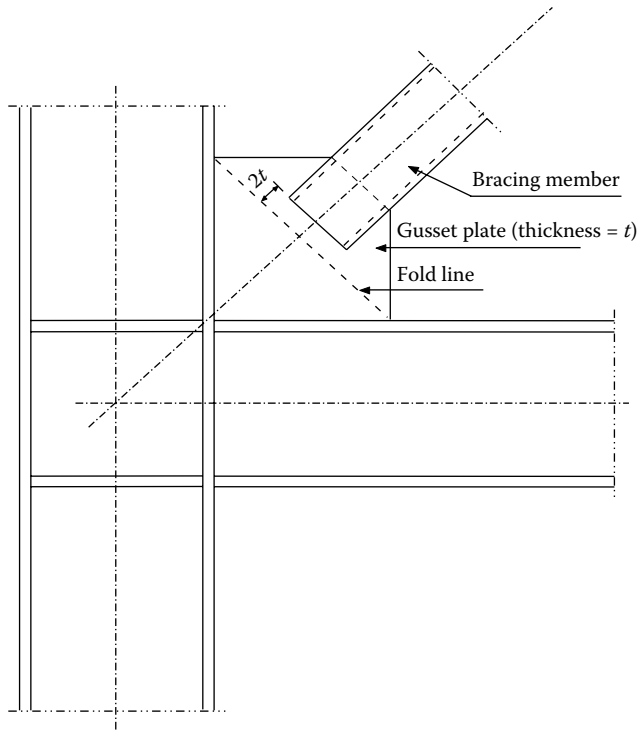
Brace-to-gusset plate connection in concentrically braced frames.
